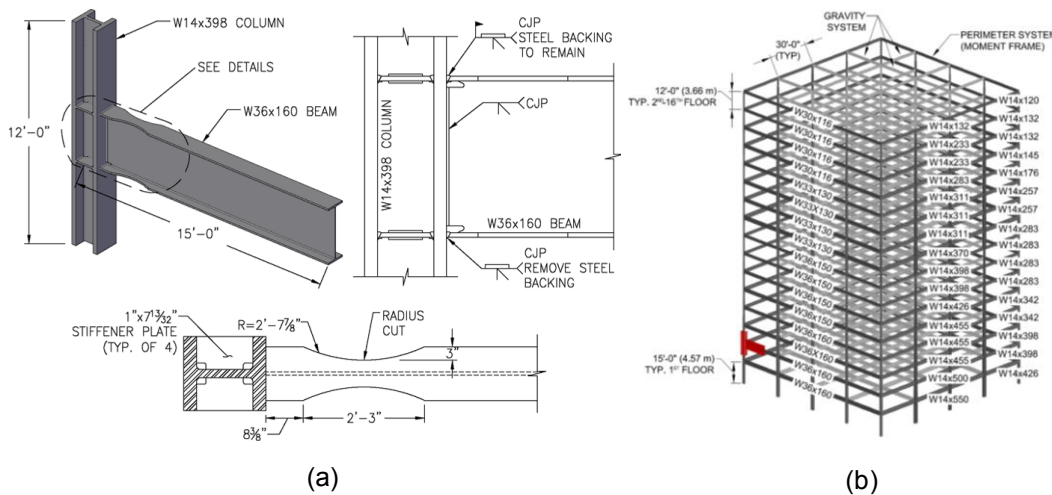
a) Details of the modelled RBS connection and b) location of connection in the subject frame
